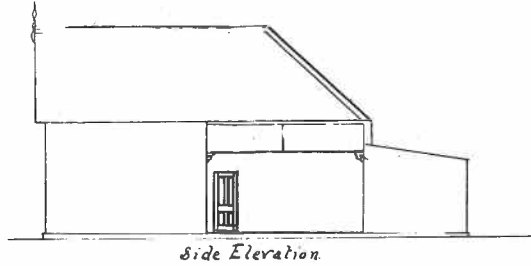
The builder A. Maclaurin's plan for the 1901 extensions, linking the two original structures beneath a new iron roof
